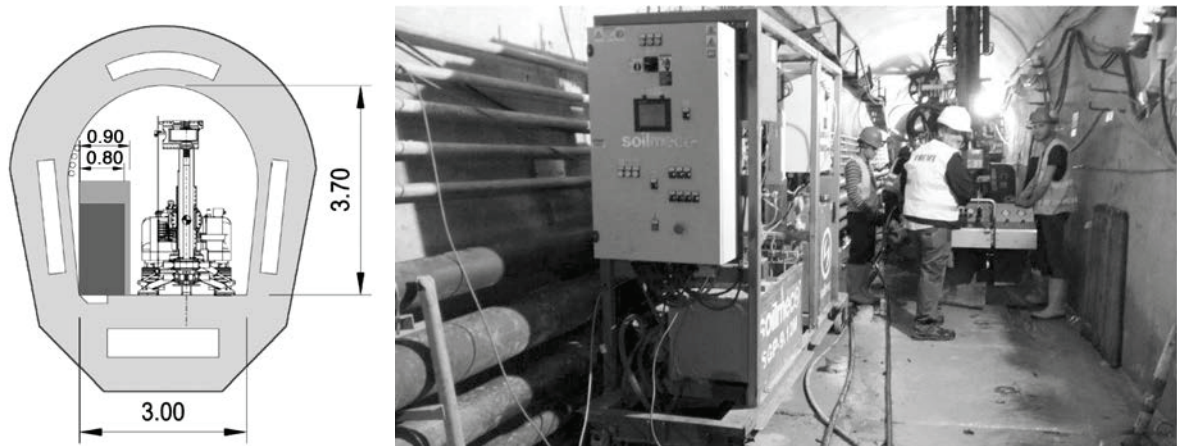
Drilling and Grouting equipment inside the Grouting Gallery (Drill Rig SM5 and BGU)
